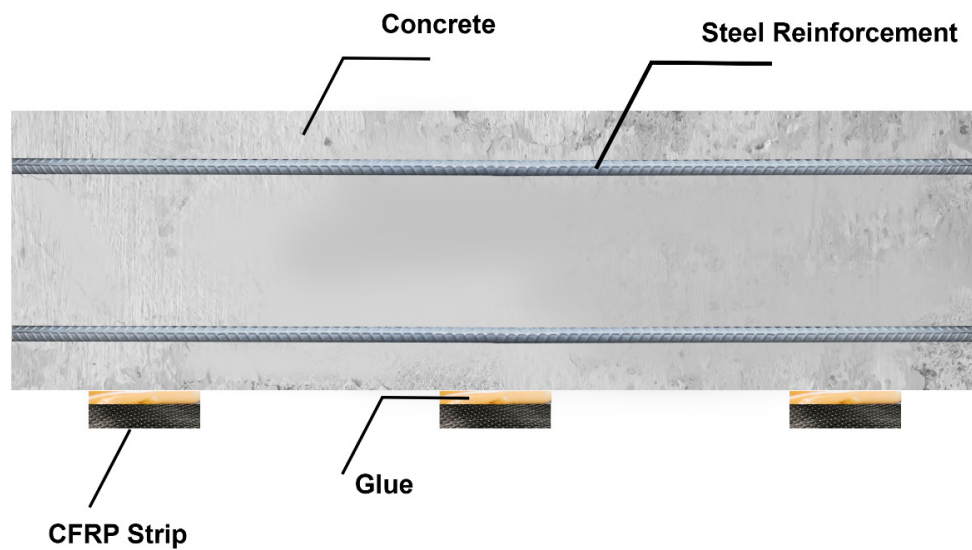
Adhesive bonding of CFRP reinforcement to concrete beam for improved strength.
